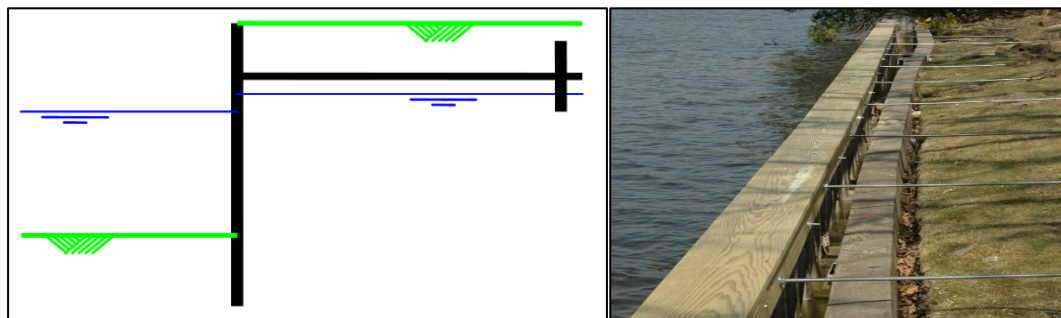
Example of Anchored wall (Meijer, E) (WaterWorks Marine)
